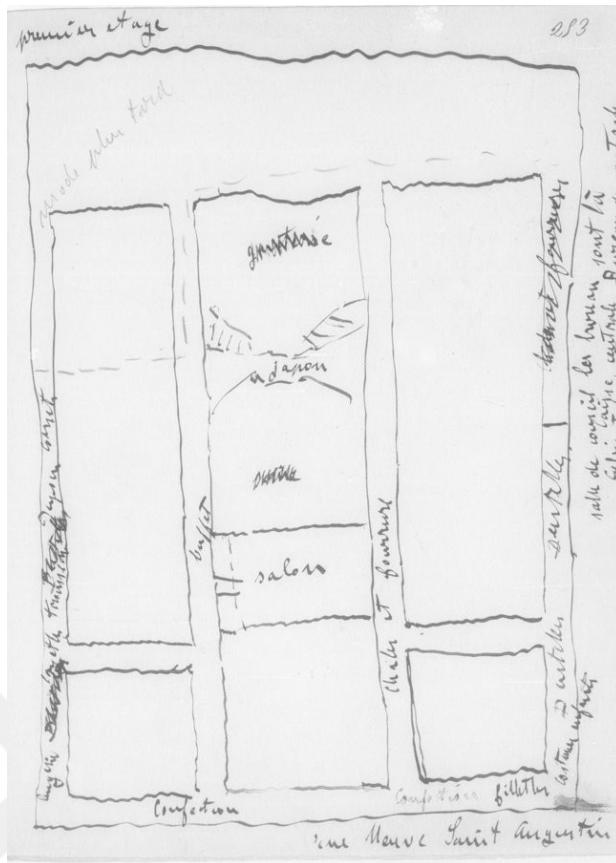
Zola's sketch of The Ladies' Paradise Floorplan – 1st floor (Zola, 1881)
